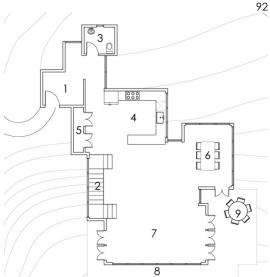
First Floor Plan - 1. Entry 2. Stairs 3. Powder Room 4. Kitchen 5. Pantry 6. Dining 7. Living 8. Deck 9. Outdoor Dining
